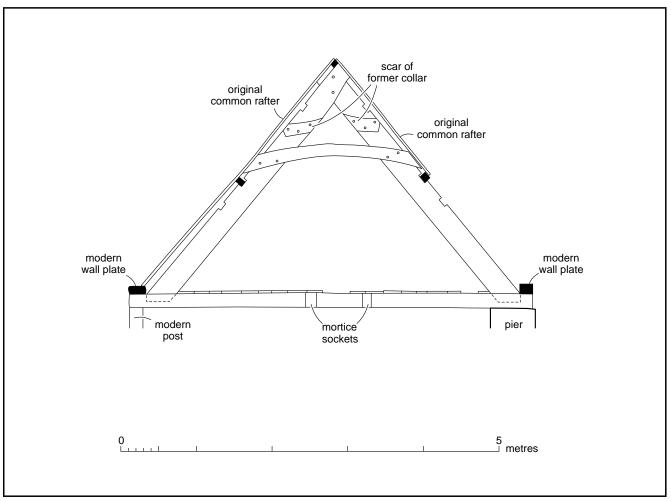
Roof truss on line of section 2 (based on Gale & Snowden Architects' drawing no. D-AL(0)004).
